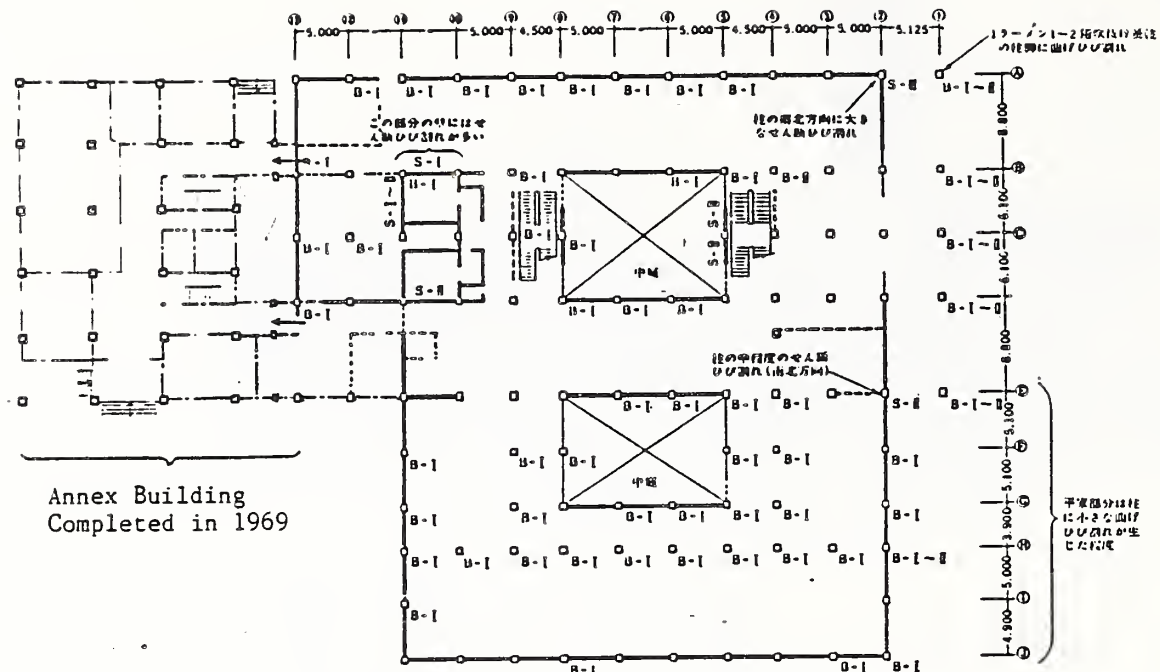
1st Floor Plan of Old City Office and the Damage in 1968 (Ref.4)
